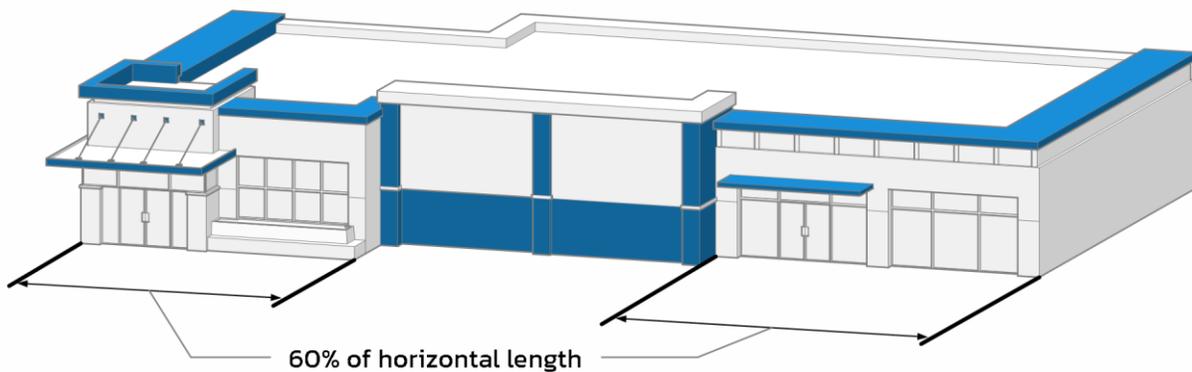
Building Articulation Requirement for Nonresidential and Mixed-Use Development
